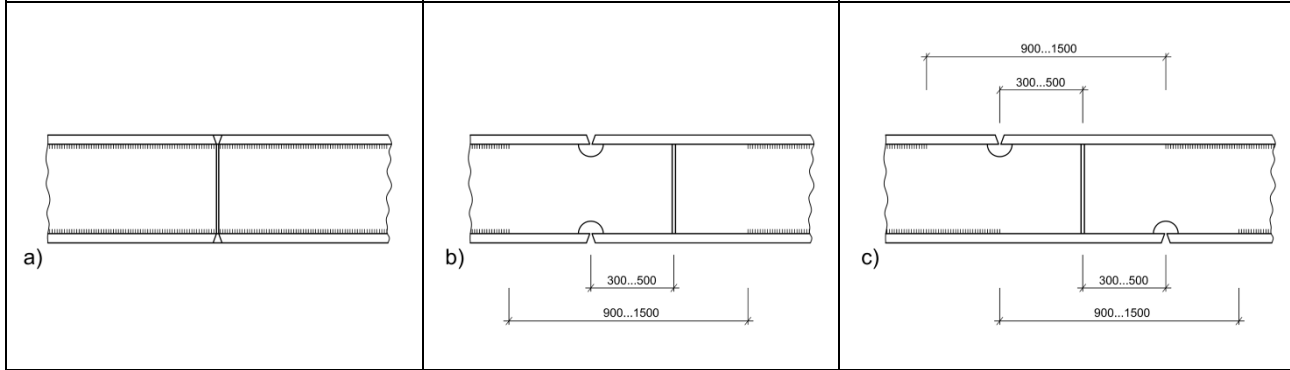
Execution types of joints: a) Butt- Joint, b) U-joint, c) Z-Joint
